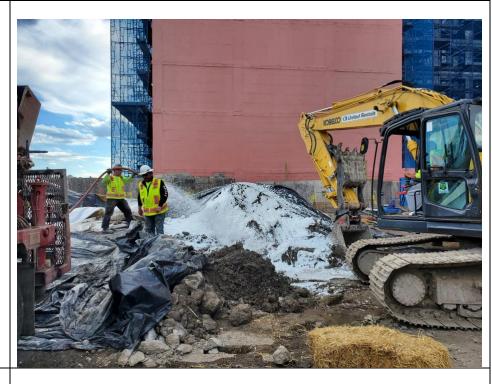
Poly sheeting placed atop ISS spoils and secured after reshaping, facing southwest.
